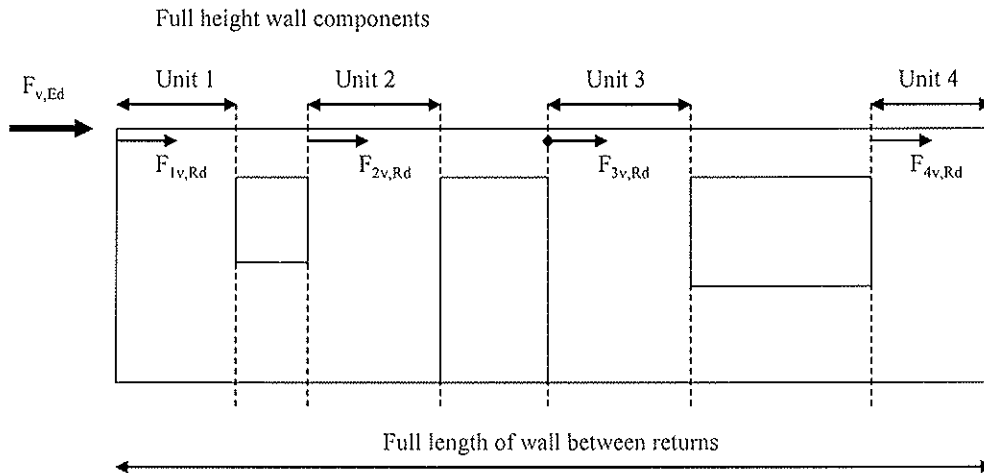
Showing how a building wall is broken into full height wall components for design. These units are independent of manufactured component joints and sheathing joints
